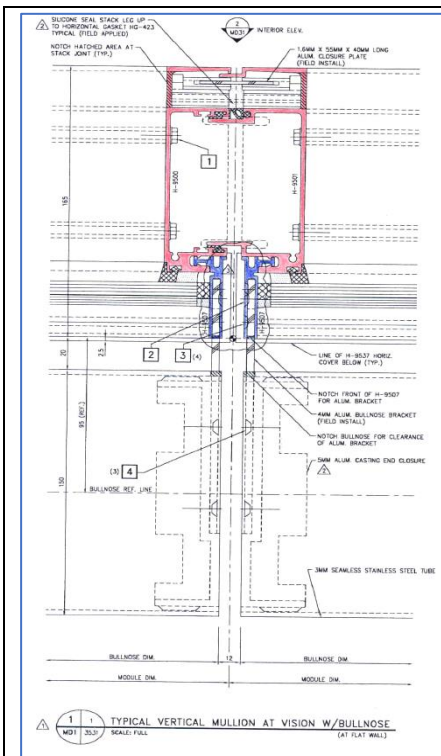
; Harmon Contractors Unitised System Curtainwall Mullion; KLCC Twin Towers
